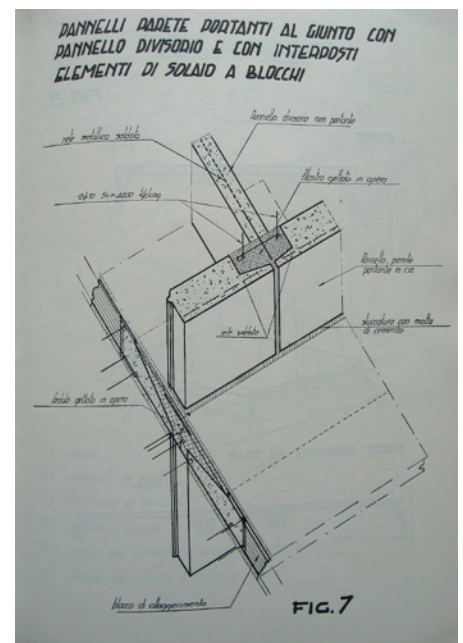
Baretts system detail of the junction between the load-bearing wall panel, the dividing panel, and the floor elements. Source: ATC archive, Turin, 1963-66.
